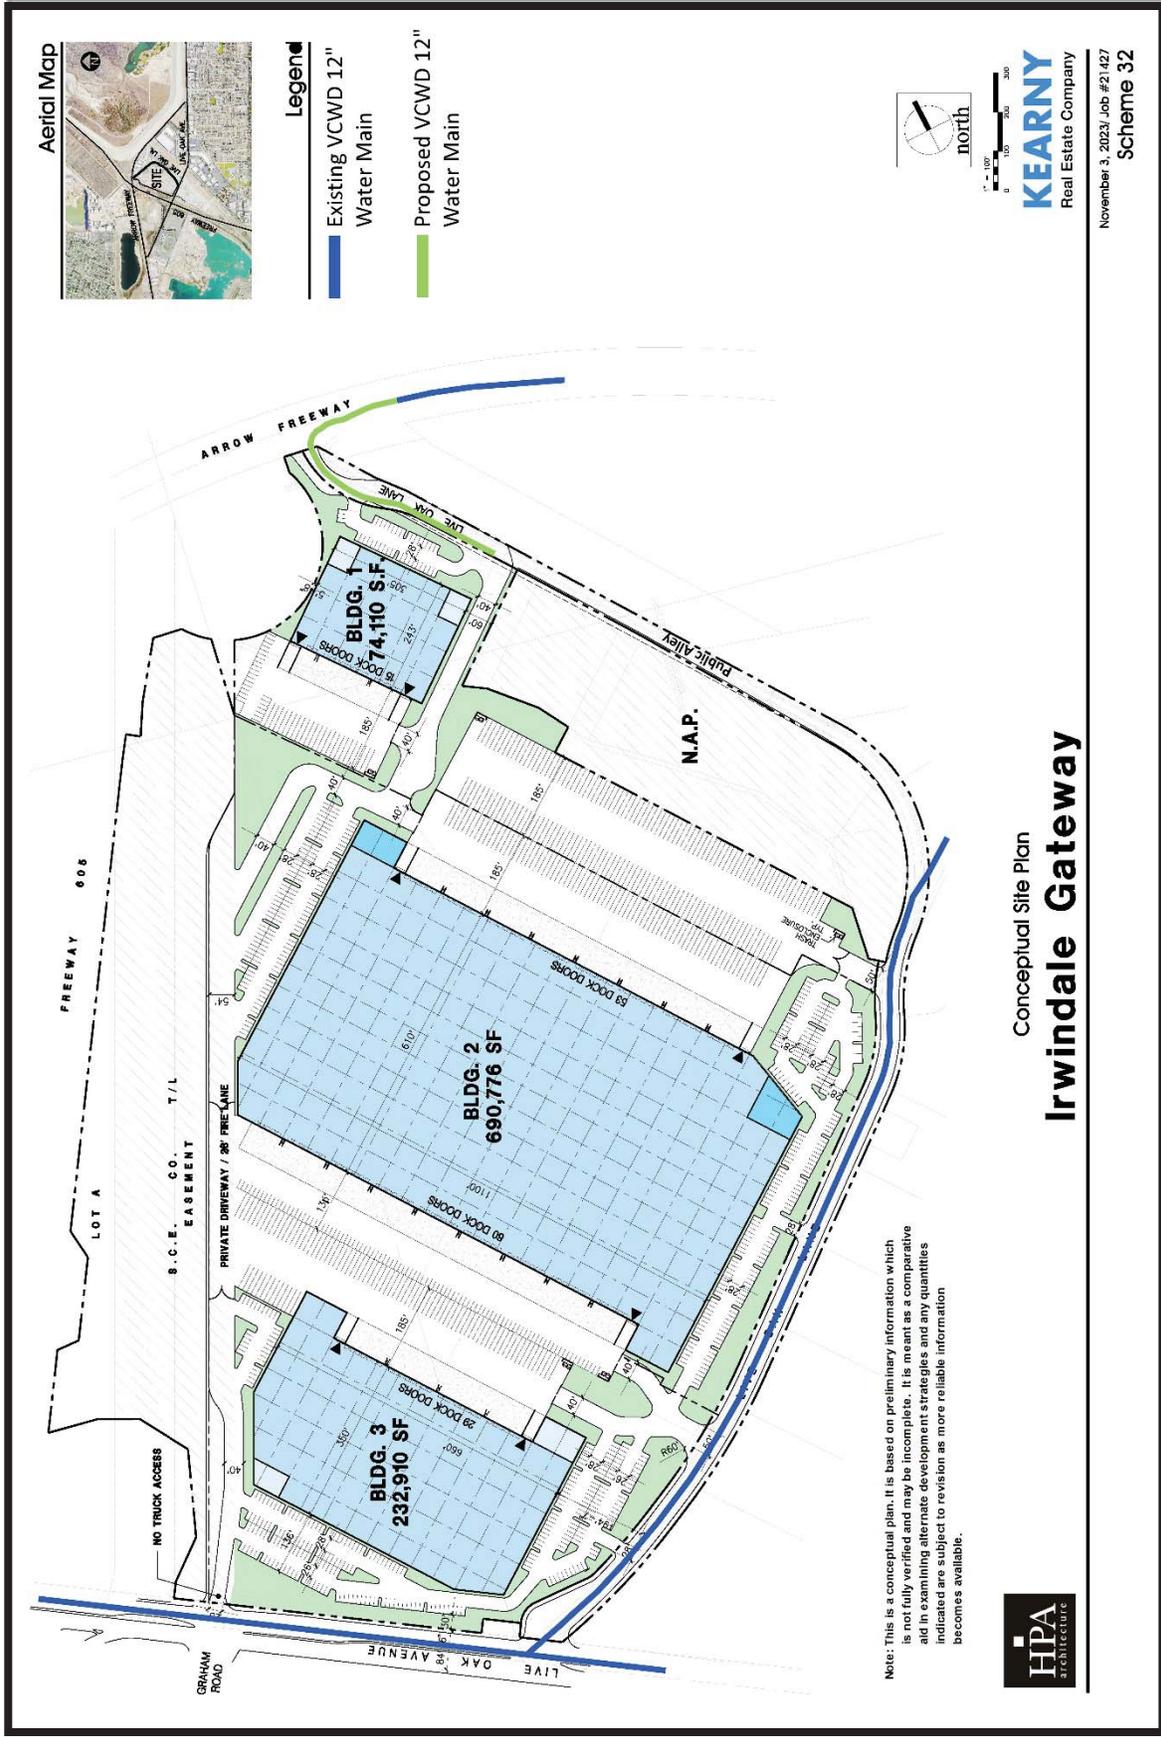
CONCEPTUAL WATER PLAN
